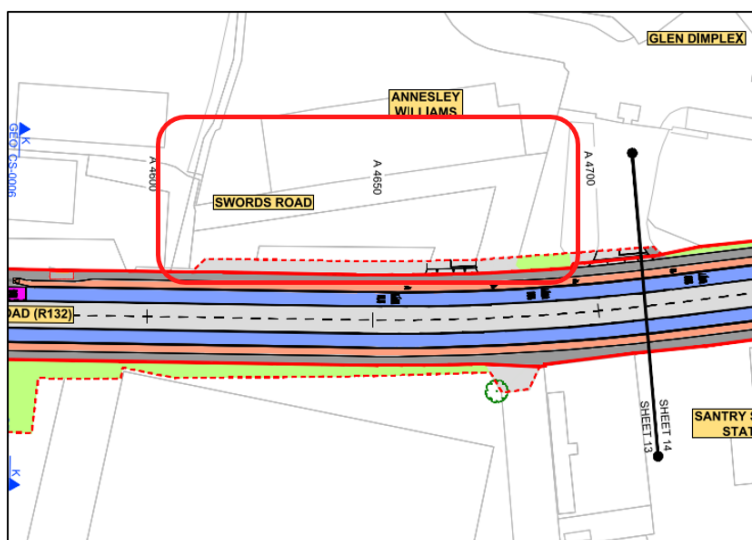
Proposed new Layout on the Swords Road (R132)
